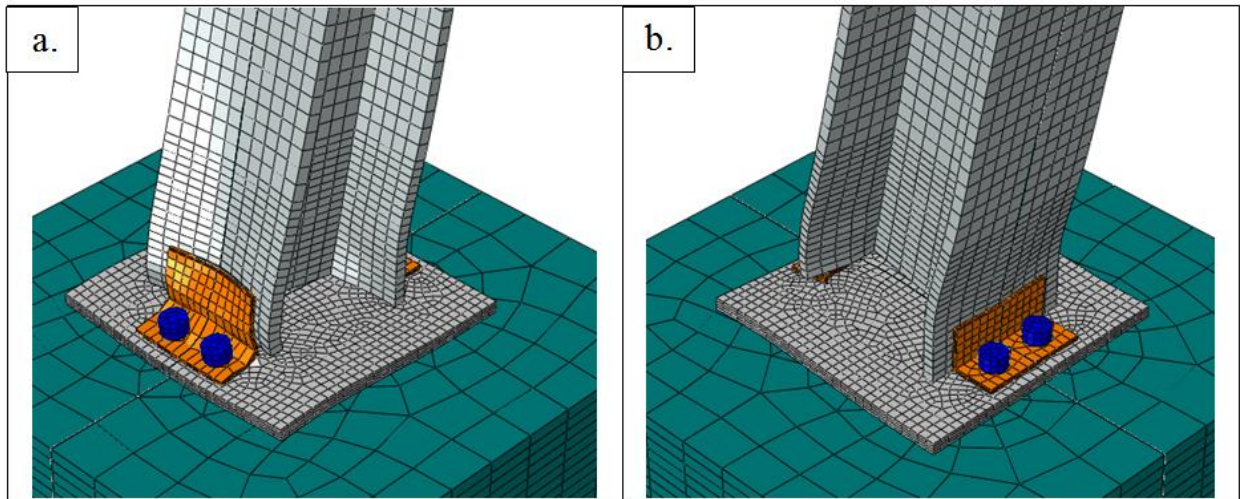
Deformation of model 6. a) Tensile flange, b) Compressive flange
